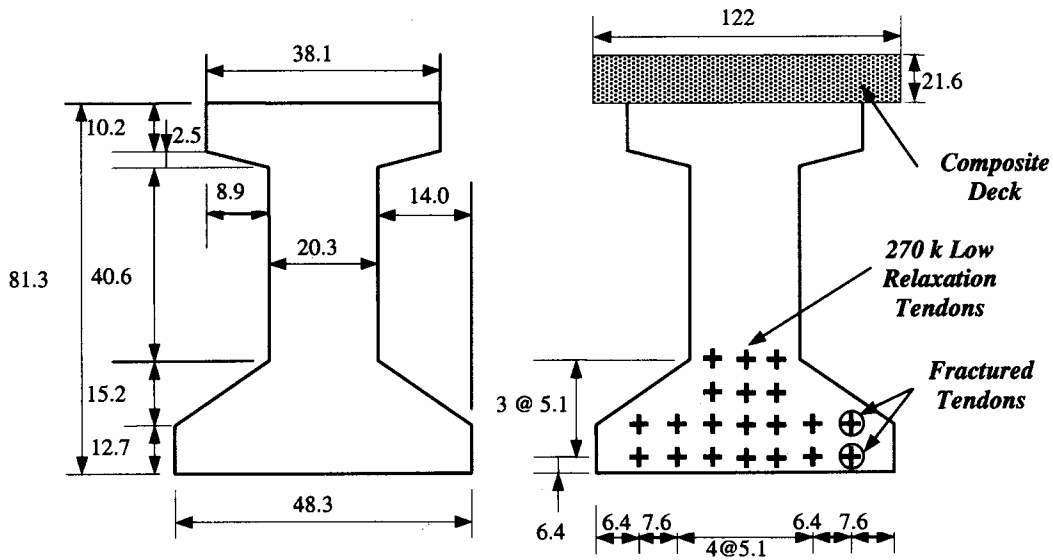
Girder Dimensions and Prestressing Details (dimensions in cm / 1in.=2.54 cm)
